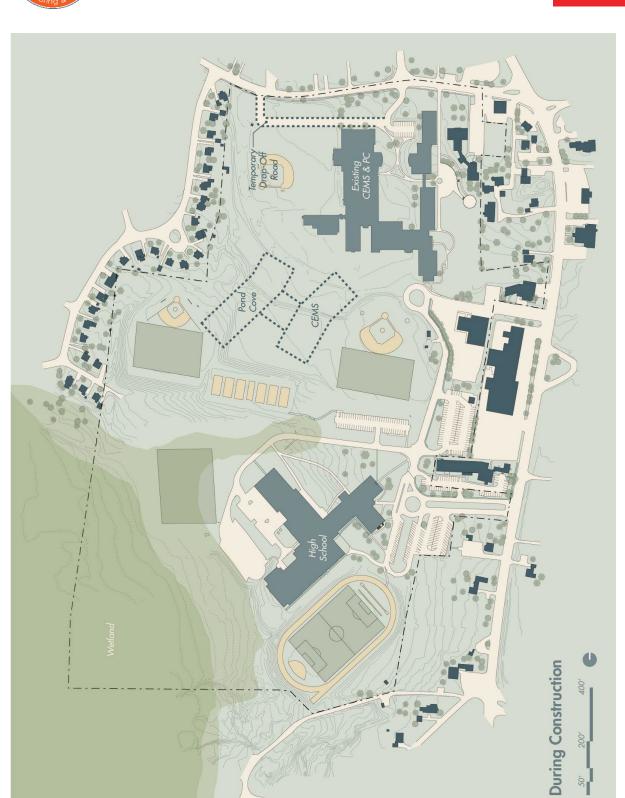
The Cape Elizabeth Schools Campus during construction of the new schools building
